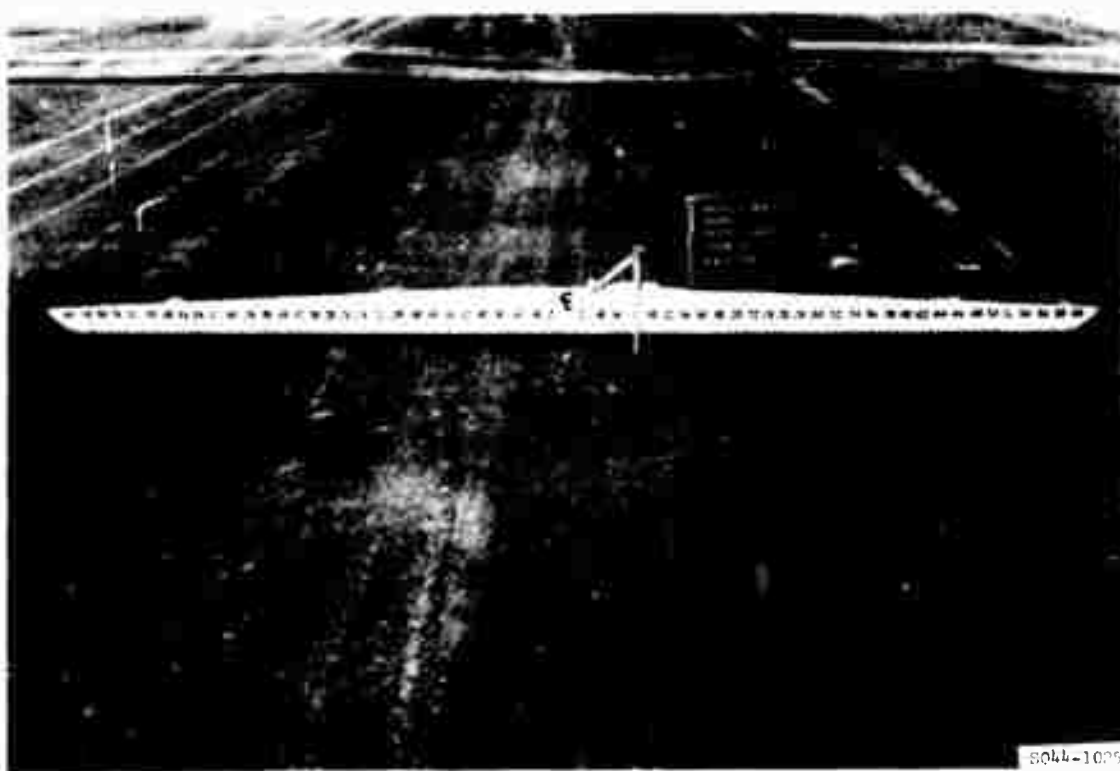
Deformation in item 3, lane 2, flexible pavement test section, at failure after 620 coverages of 240-kip twin-tandem assembly
